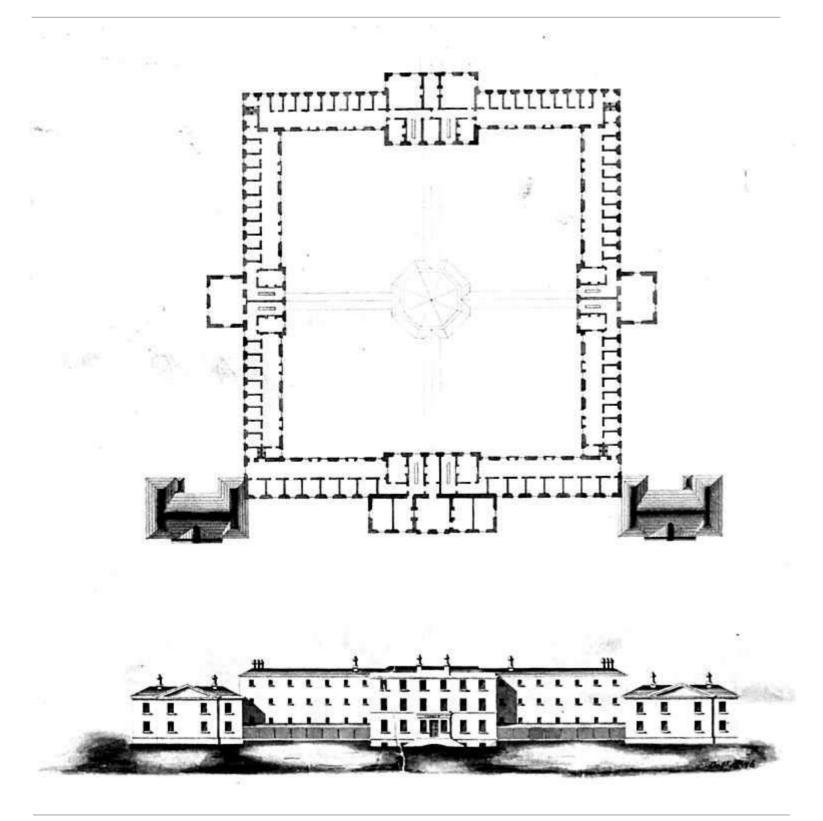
3 Original plan and elevation drawings of the Lower House (Former Richmond Lunatic Asylum).
